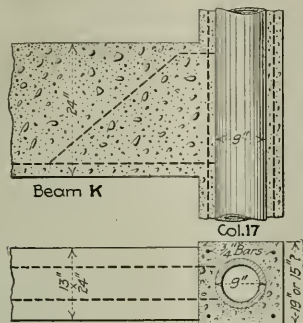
SKETCH OF CONNECTION OF BEAM K TO COLUMN 17, AS BUILT
